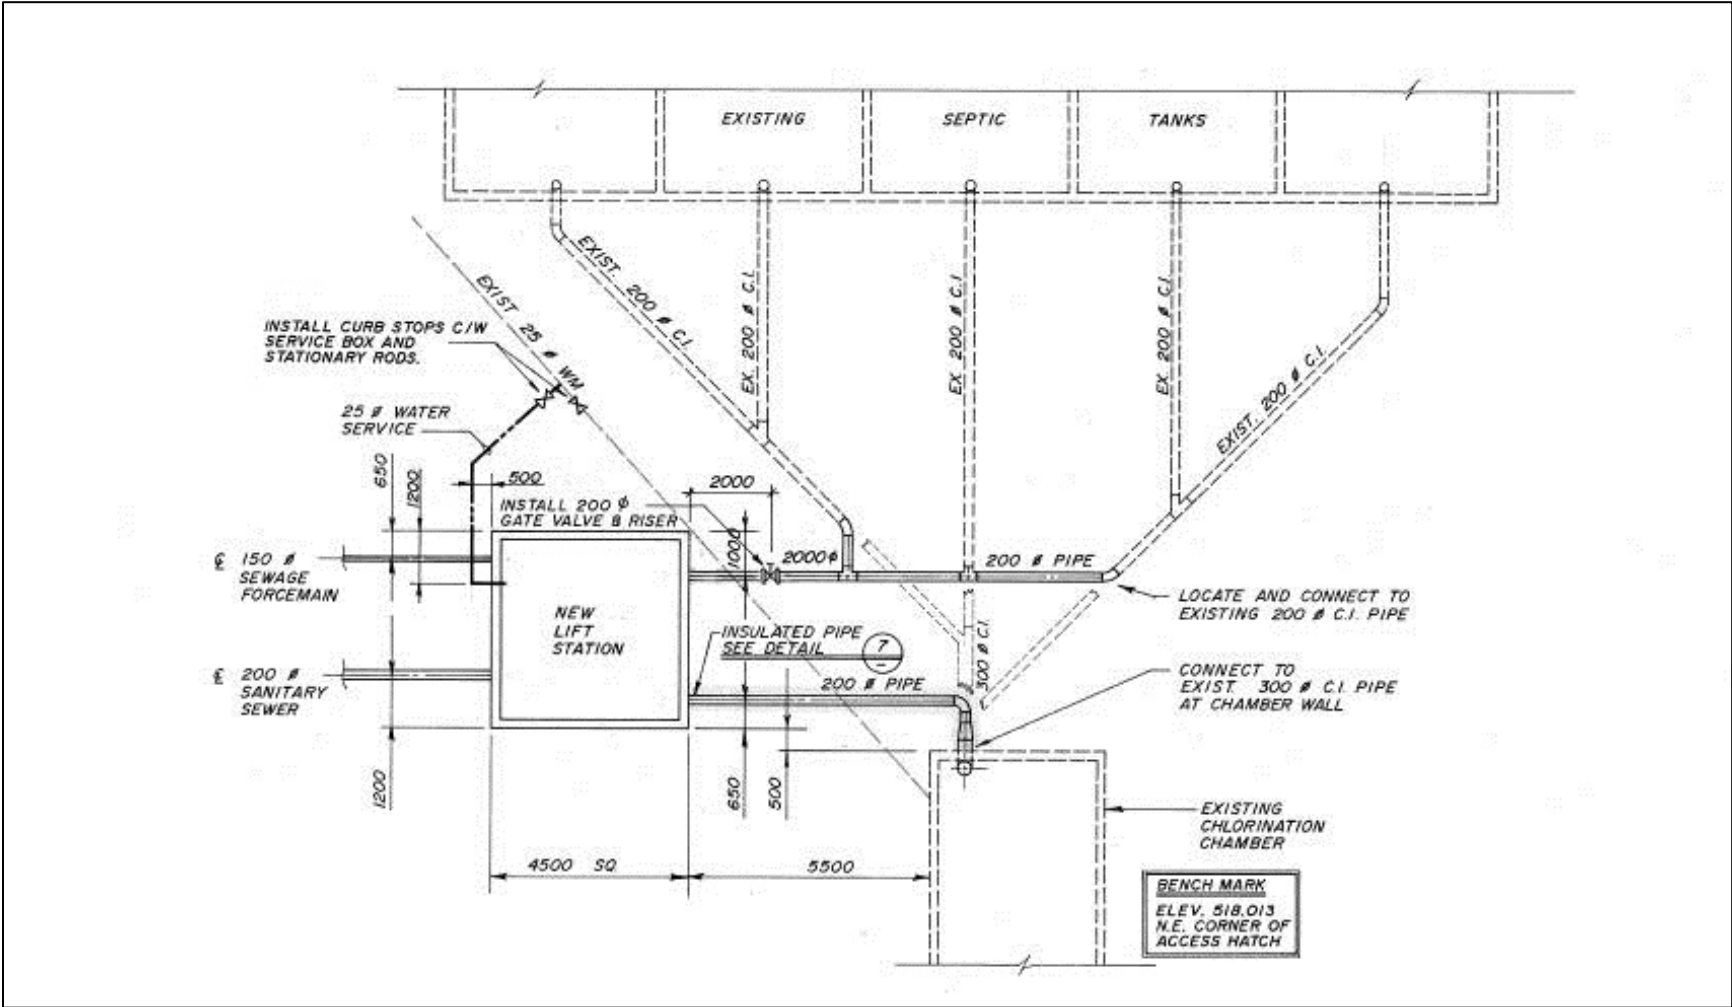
1988 Construction drawing - Pipework of lift station connection to the septic tank and chlorination chamber (Modified from Bullée Consulting Ltd. 1988c)
